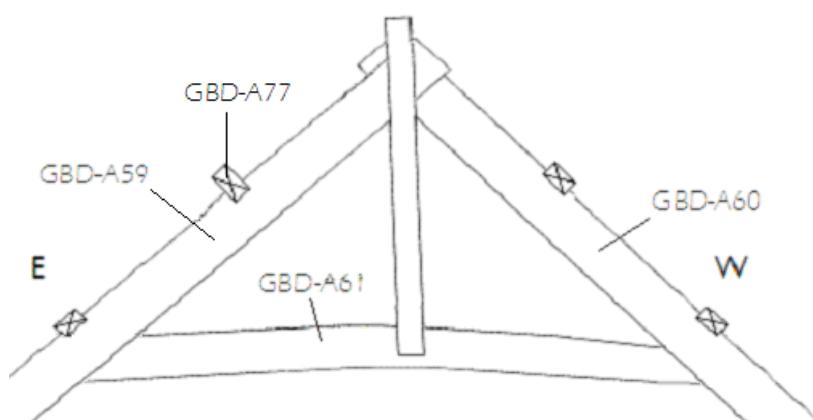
West range; sketch of truss 2, showing the location of samples GBD-A59–61 and GBD-A77
